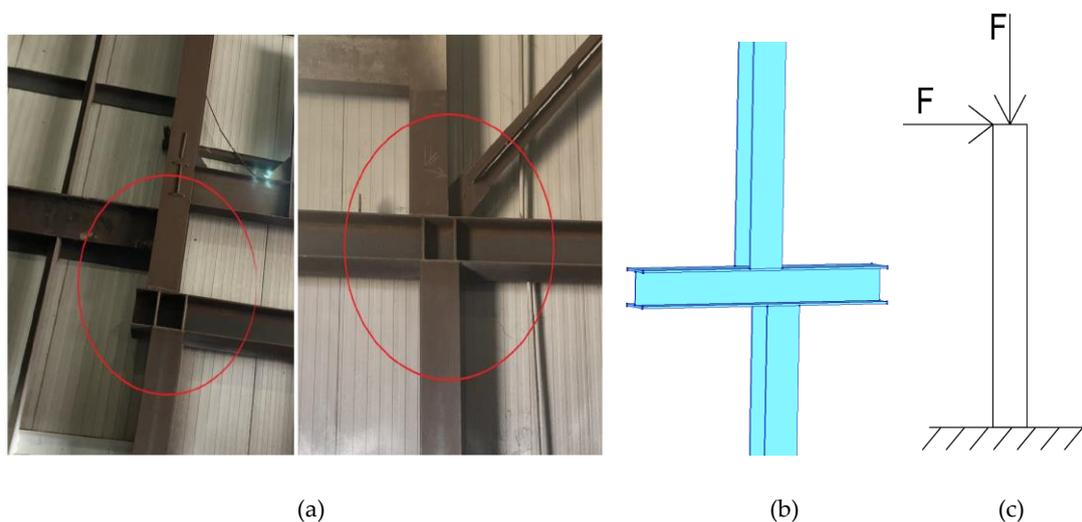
Column connection eccentricity: (a) actual conditions on site, (b) FE model and (c) analysis scheme
